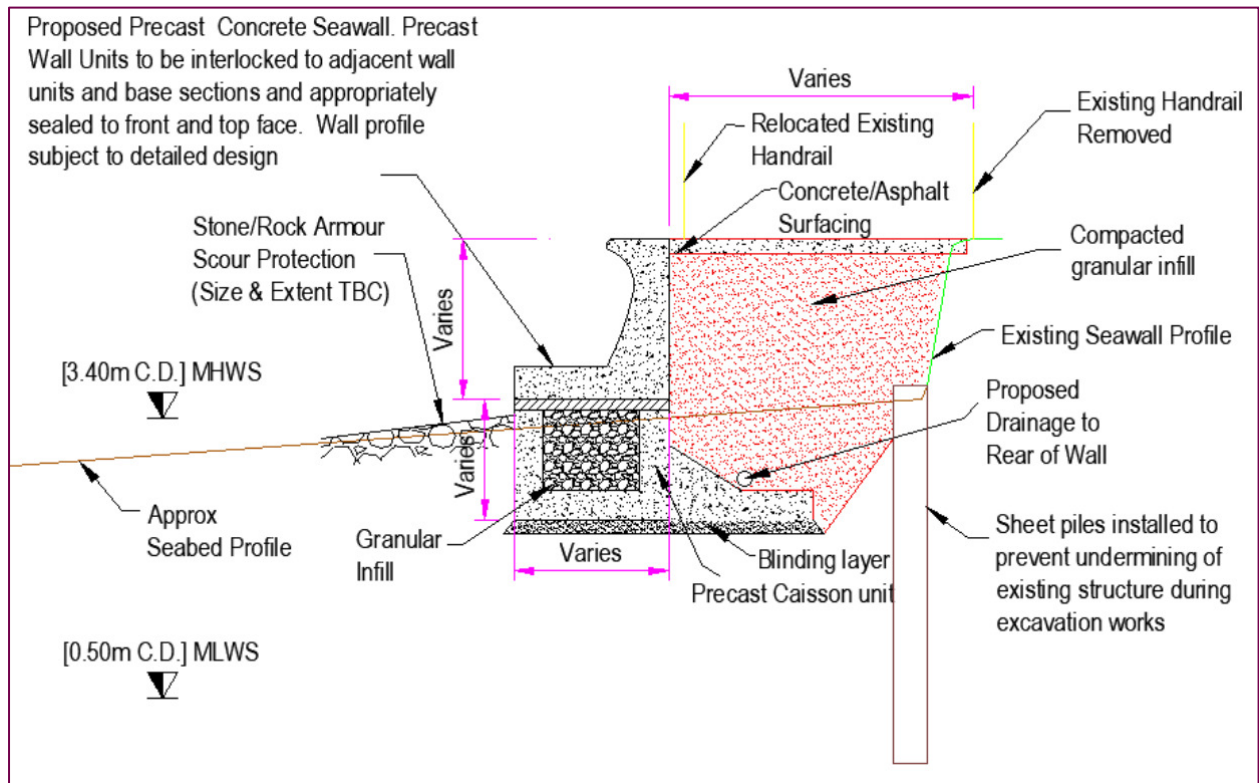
Proposed Section for Northern and Southern Section of Seawall
